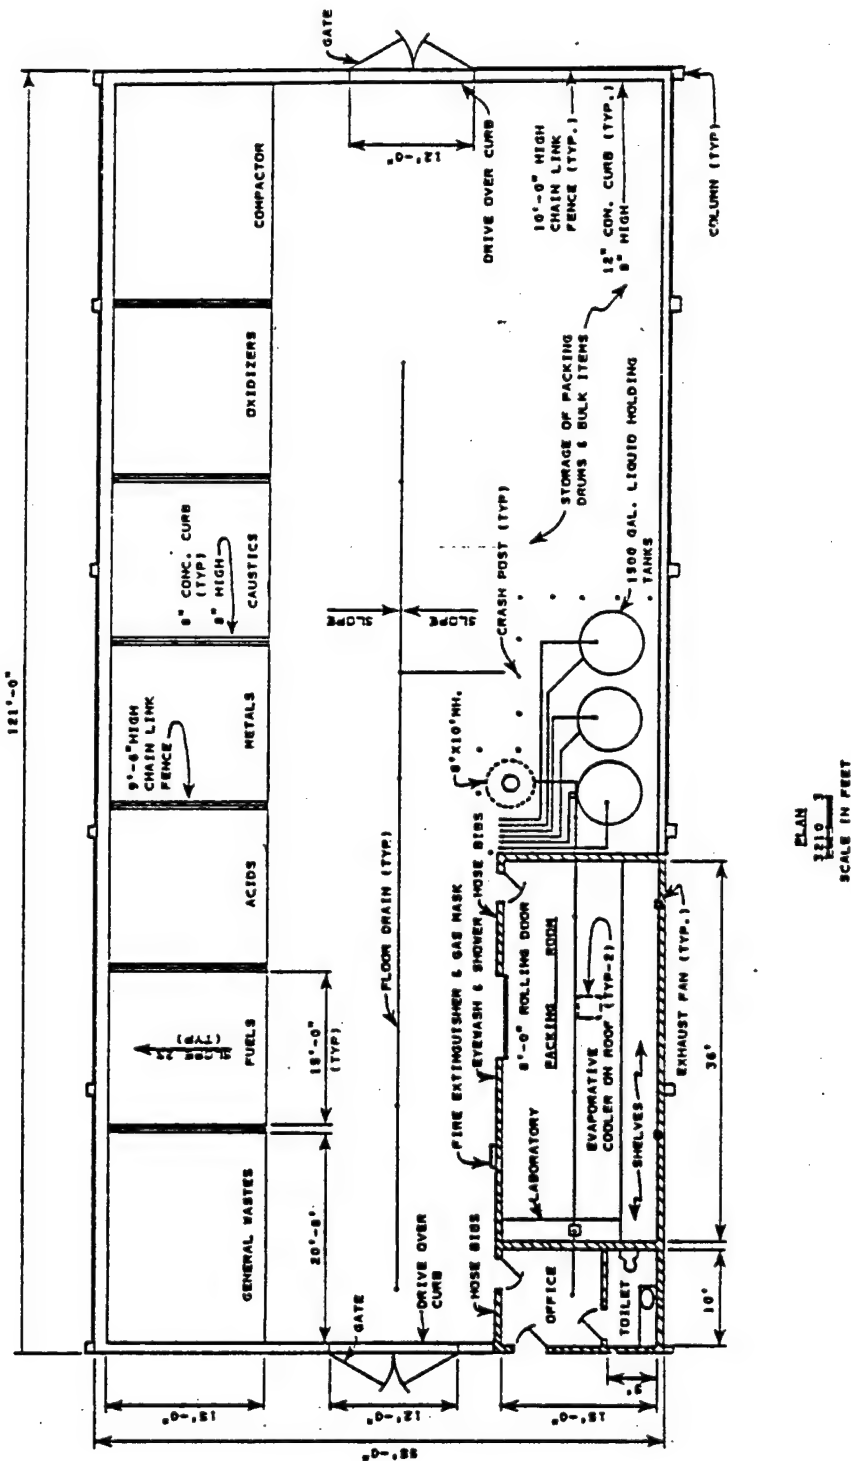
Detailed layout of hazardous waste storage/transfer facility.
